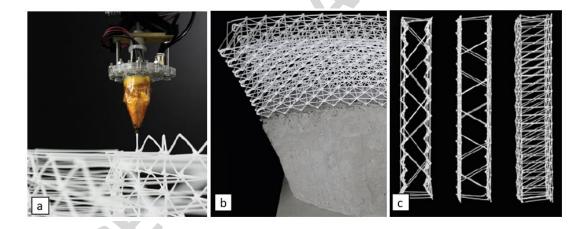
Mesh-mould combines formwork and reinforcement system for concrete (Hack & Lauer 2014)
